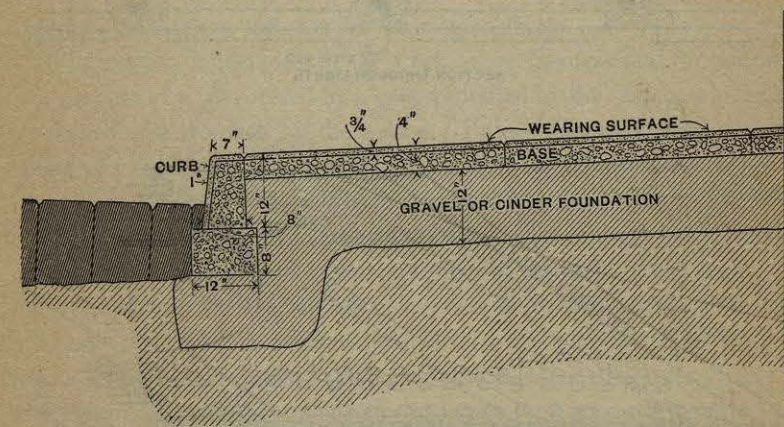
Typical Concrete Sidewalk and Curb. (See p. 602.)
